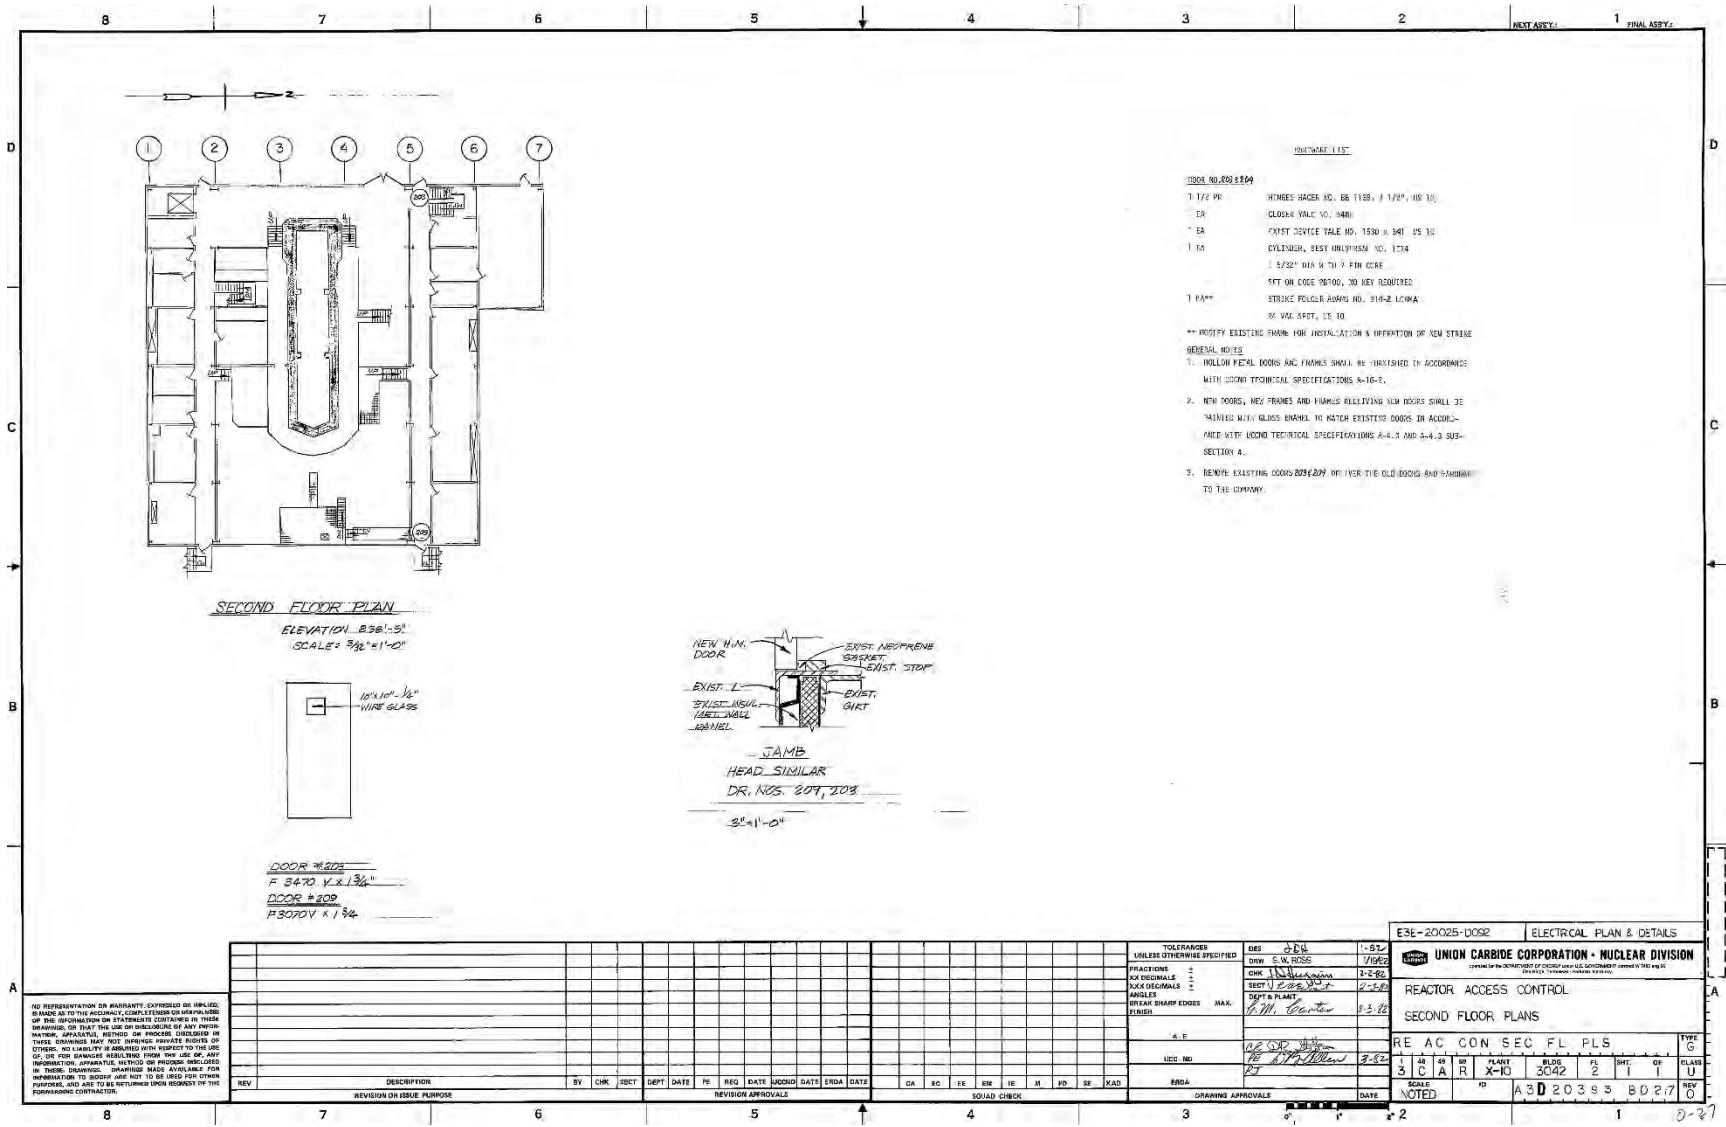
Reactor access control plans pertaining to replacing the second floor doors in the single-leaf entries on the east and west elevation of the north wing of Building 3042 (Union Carbide Corporation, January 19, 1982).
